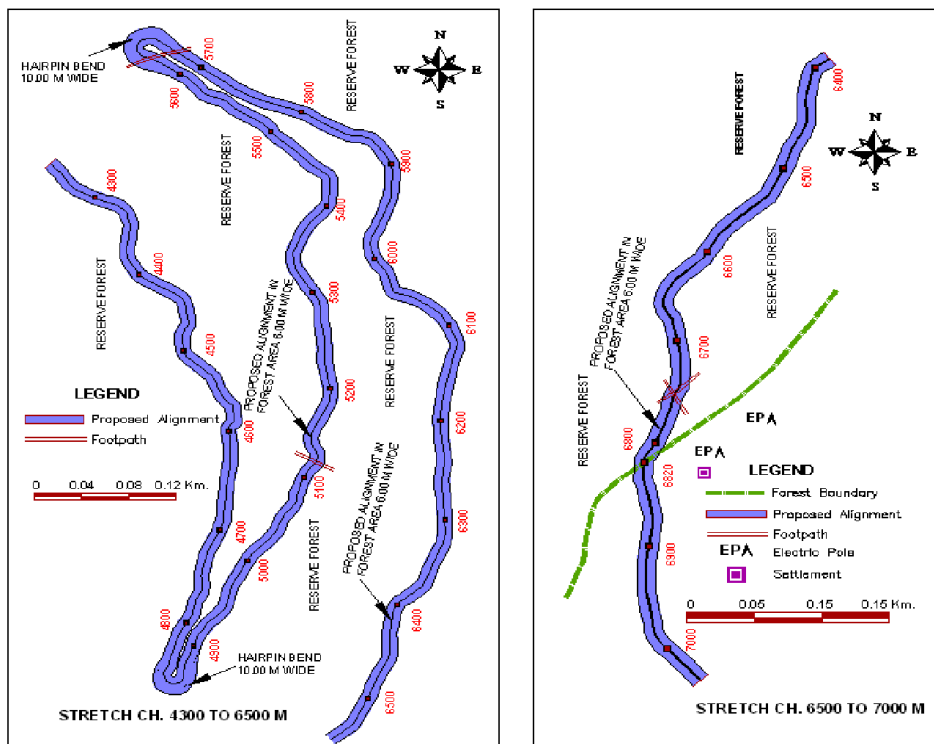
(d) - Alignment plan from 4300 m to 7000 m
